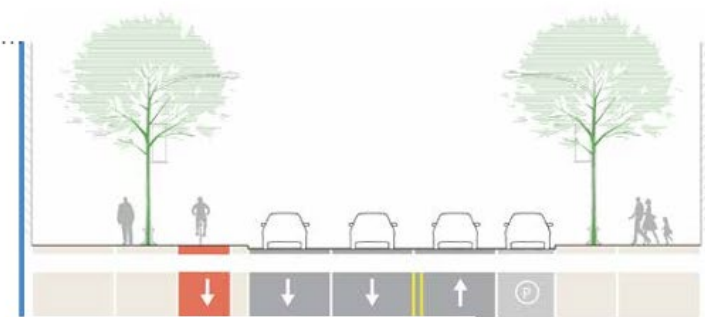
Fifth Street typical section Brazos Street to I-35
